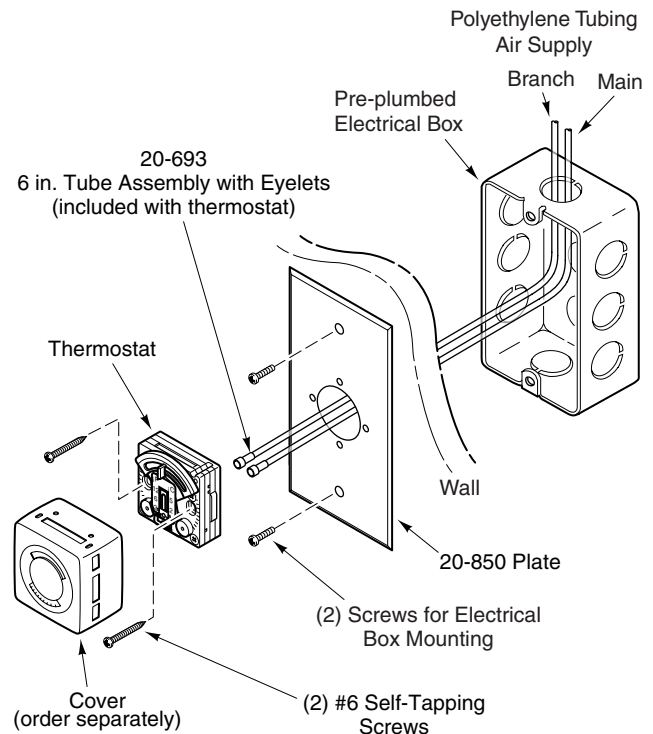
Flush Mounting of Thermostat, Using 20-850 Plate and Pre-Plumbed Electrical Box.
